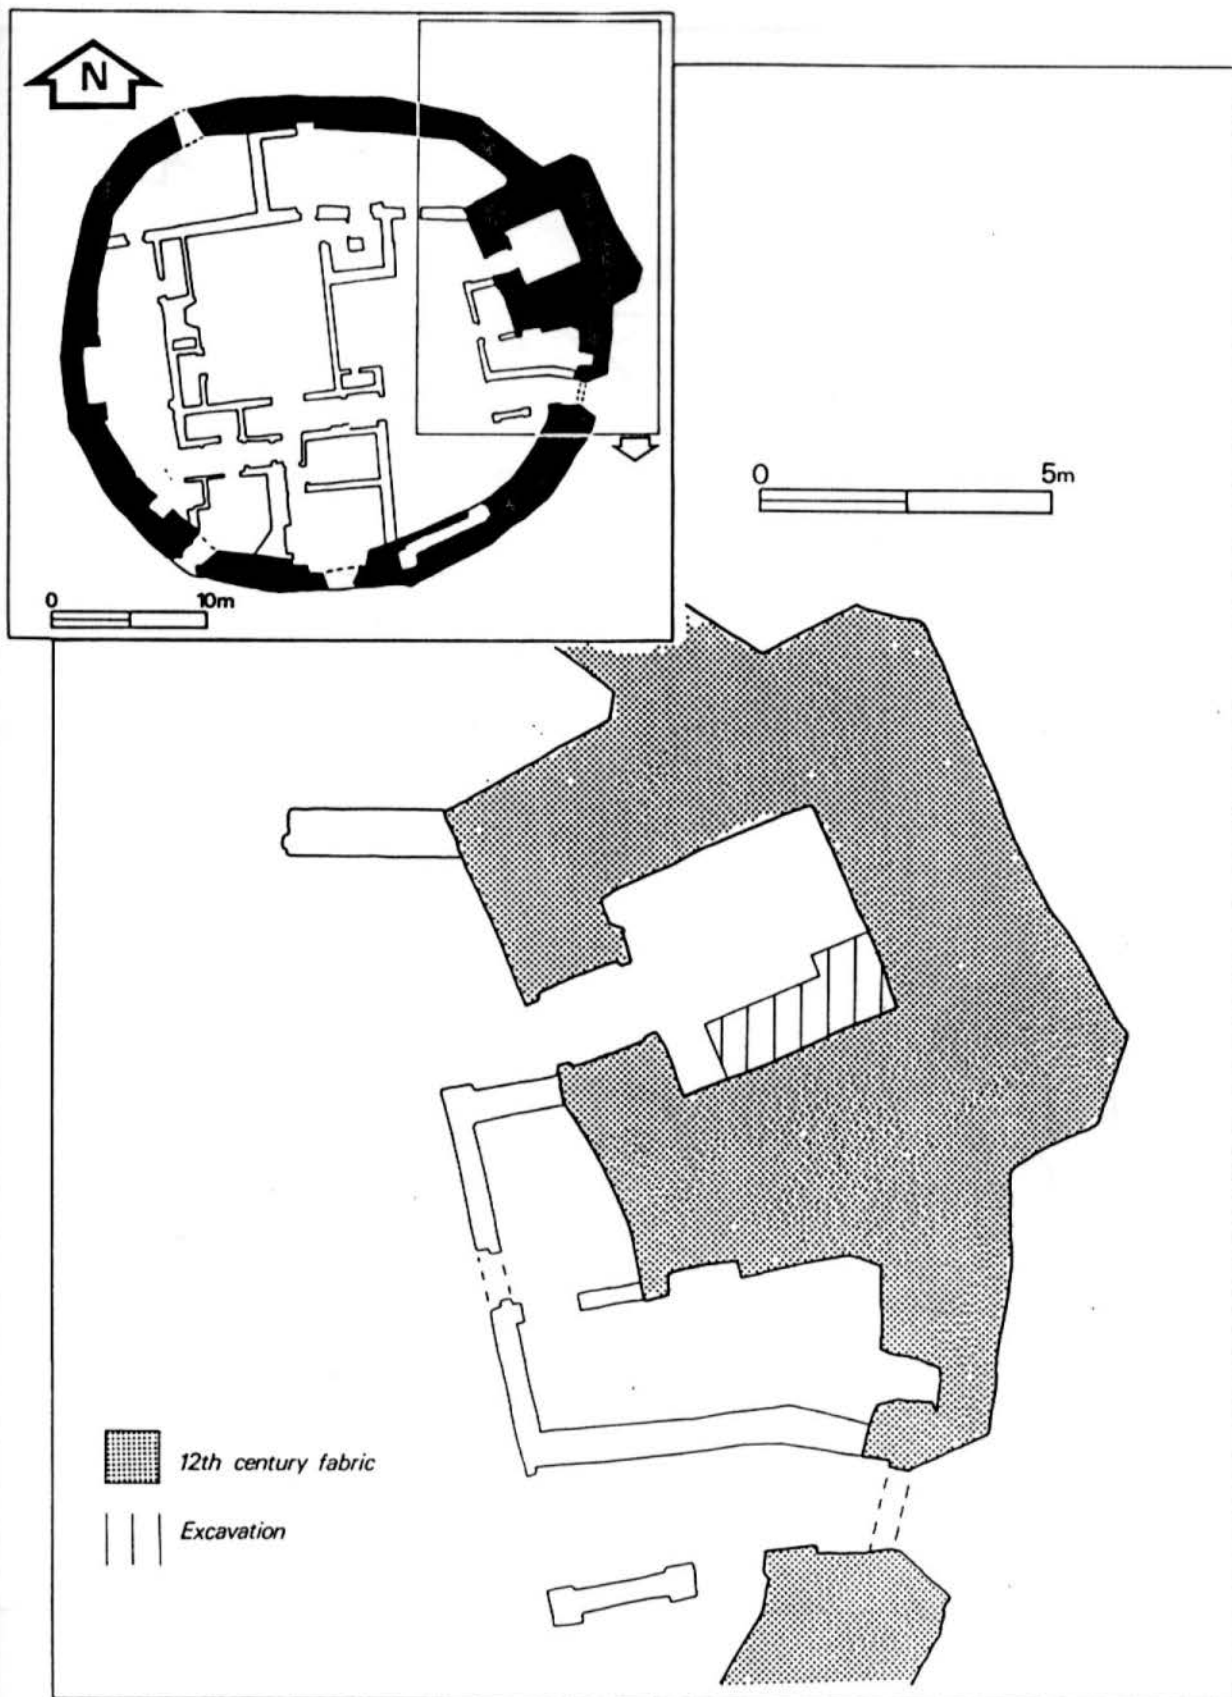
Tamworth Castle, showing the 12th century stone tower and location of excavation.
